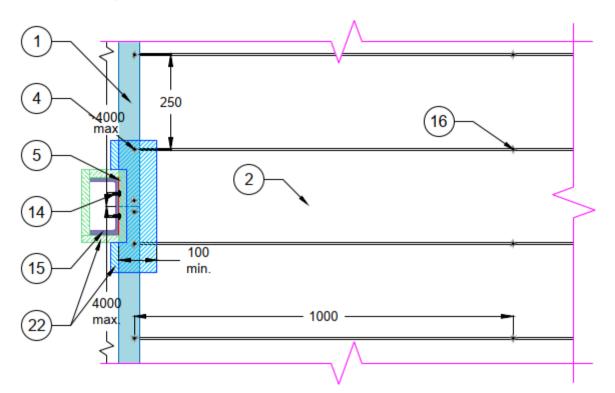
Protected steel beam perpendicular to spine wall – option 1 (section A-A) view
